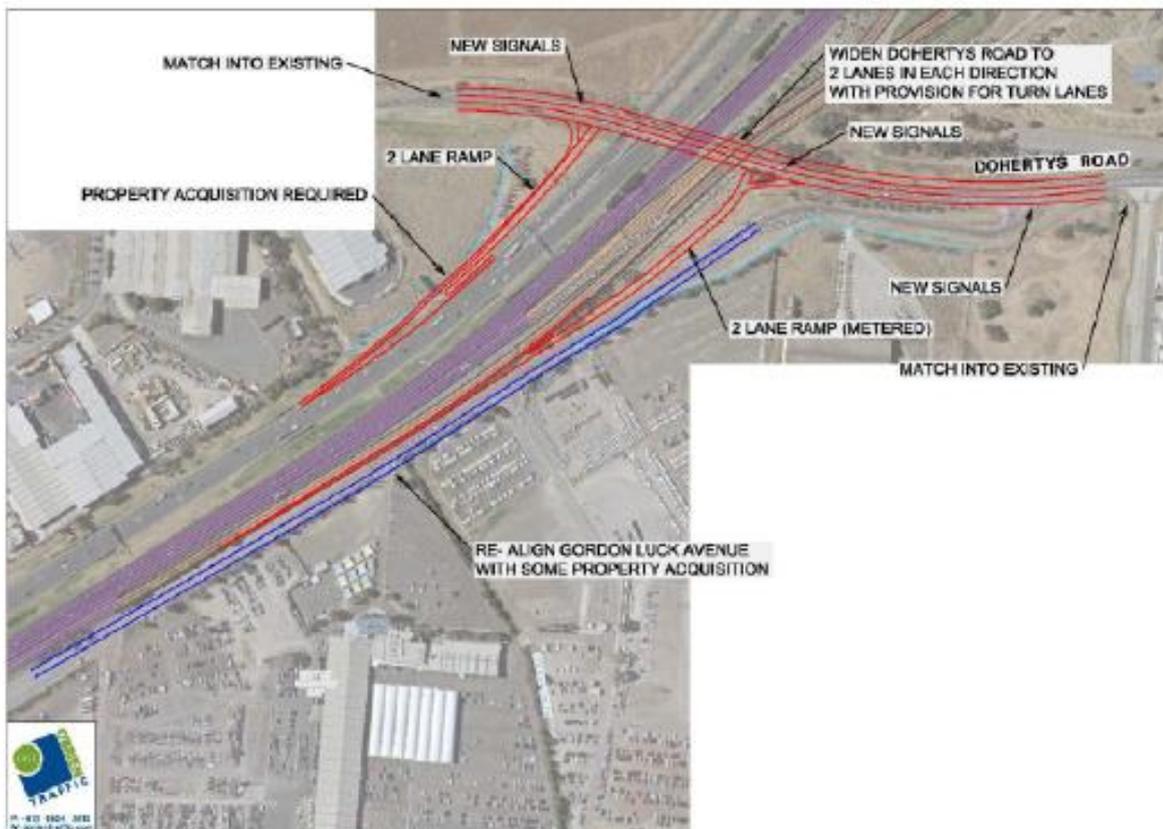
Potential west facing ramps at Dohertys Road to/from M1
